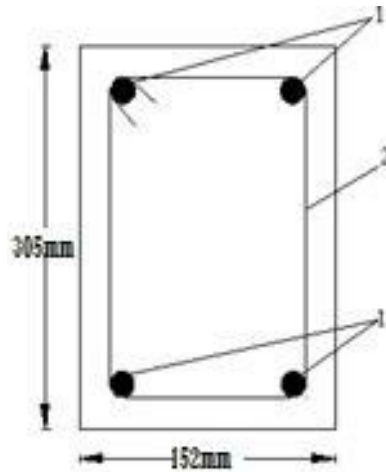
Cross section: 1 – Longitudinal rebar's, 2 – close stirrups
